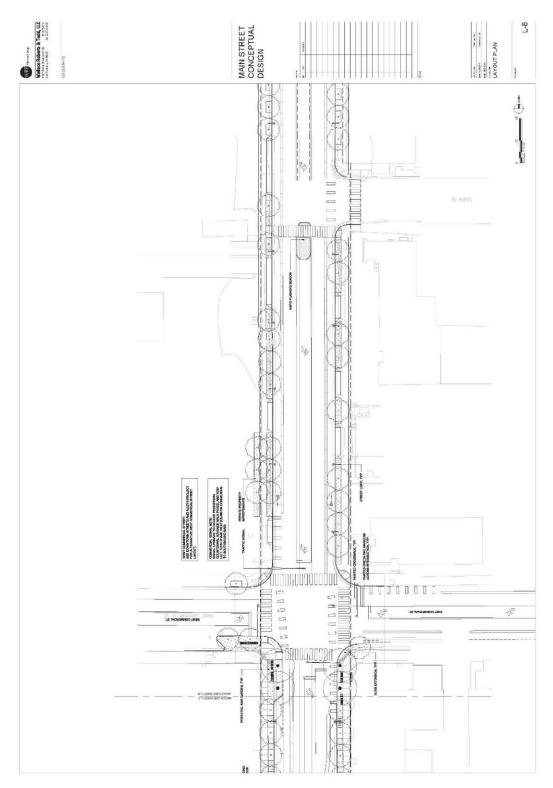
Conceptual Designs for Main Street corridor enhancement include locations of additional lighting fixtures (Source: Willits Main Street Corridor Enhancement Plan, 2016)
